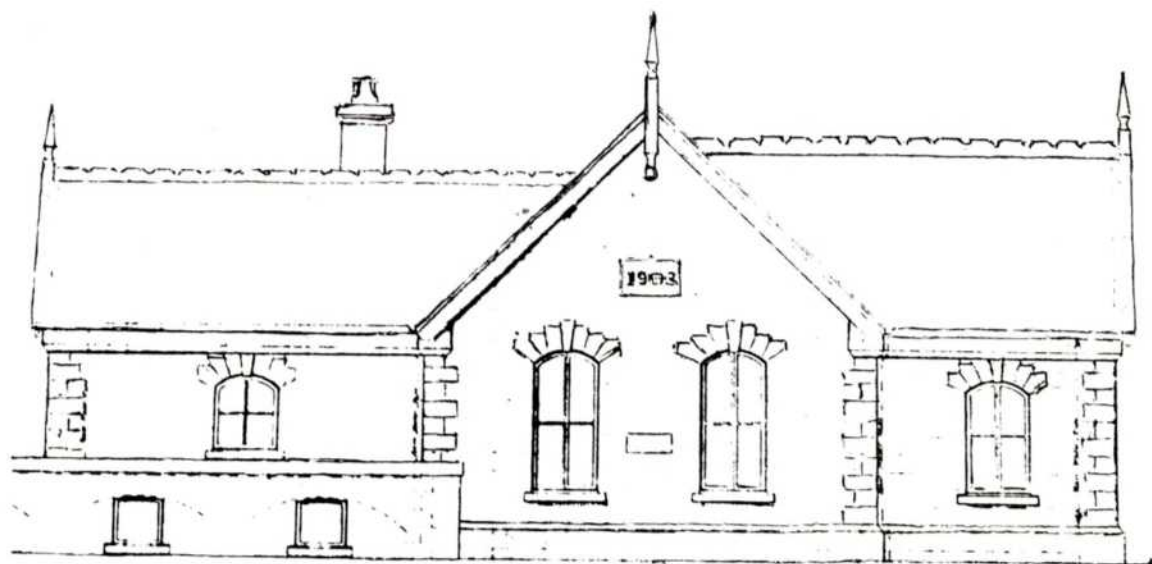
E. Elevation of 1903 Pump House, covered settling tank on the left.
